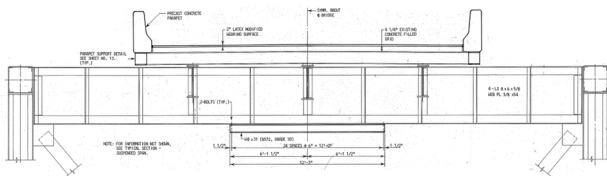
Typical Cross-Section for Anchor Truss Spans (Similar for Suspended Main Span)
